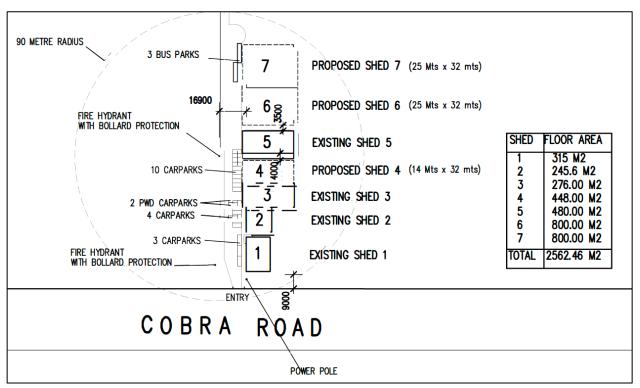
Extract from Development Plans – Site Layout Plan of Tourist Attraction
